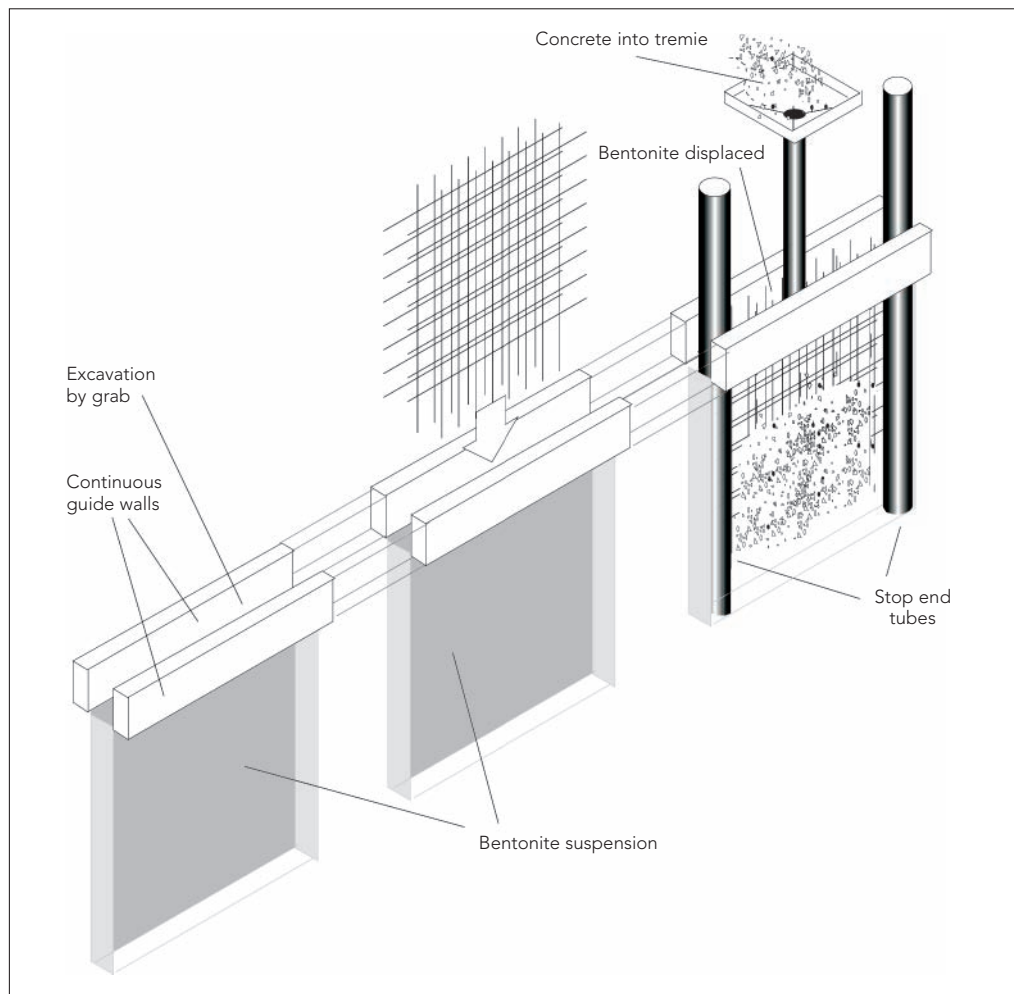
Stages in the construction of a diaphragm basement wall using a bentonite slurry to maintain the walls of the excavation until the reinforcement and concrete are placed.
